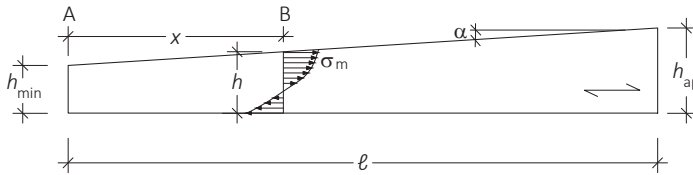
Single-tapered beam with beam width b . (STEP 1995 Article E4)
